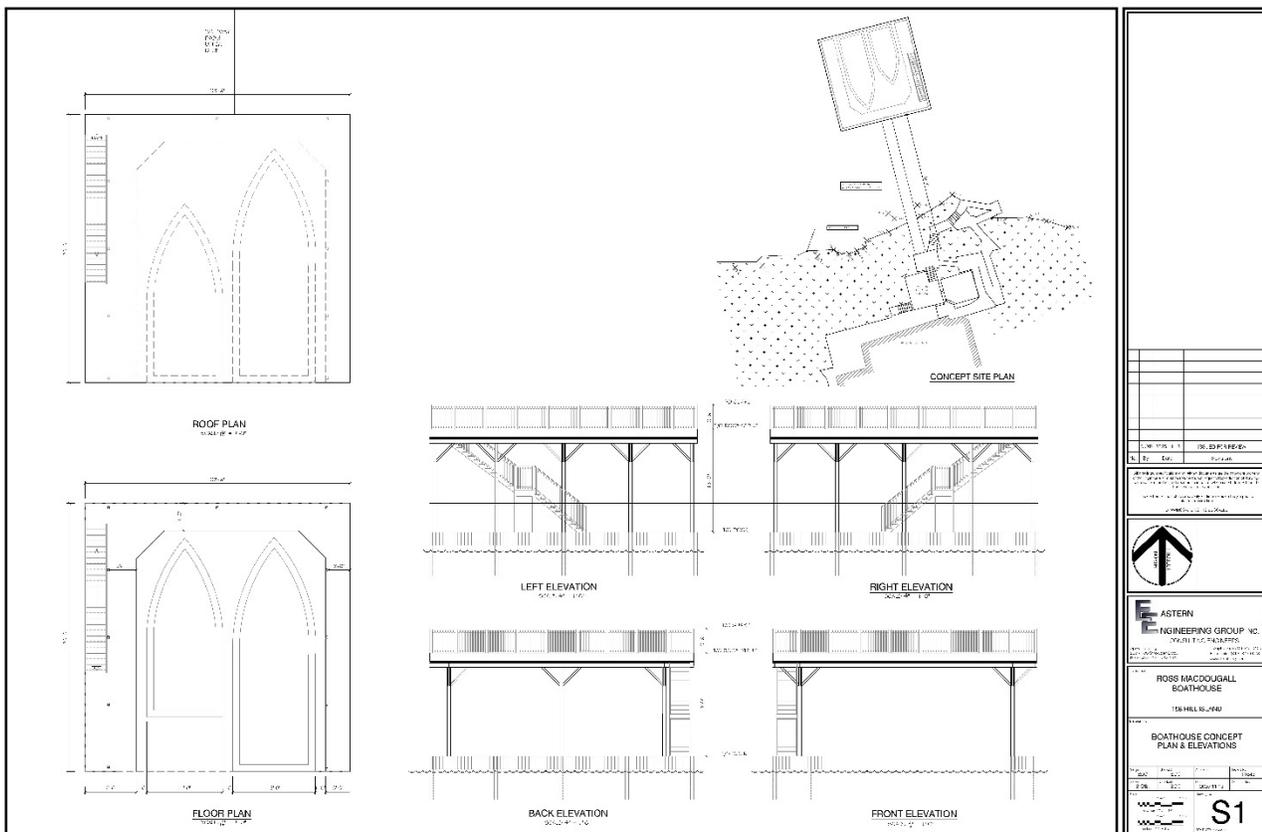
Conceptual Site Plan (Source: Eastern Engineering Group Inc.)
